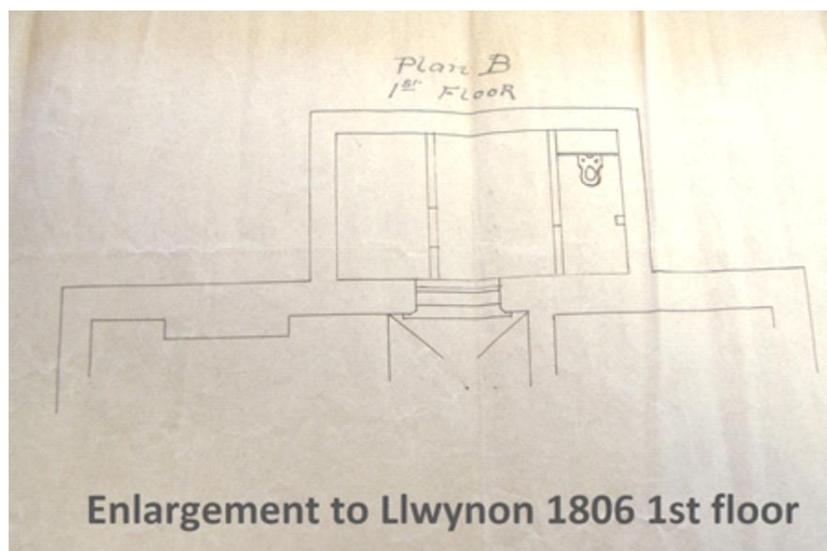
Extension to the 1st floor, 1806.⁵⁴
